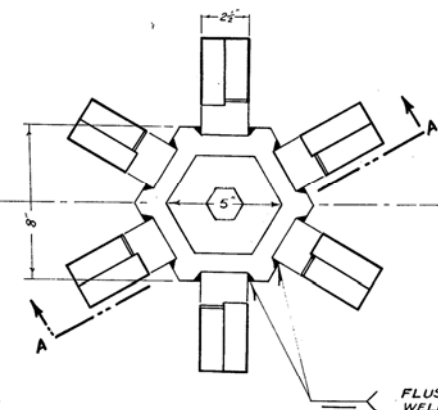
SUPERSTRUCTURE PLAN (UNIT 1)
